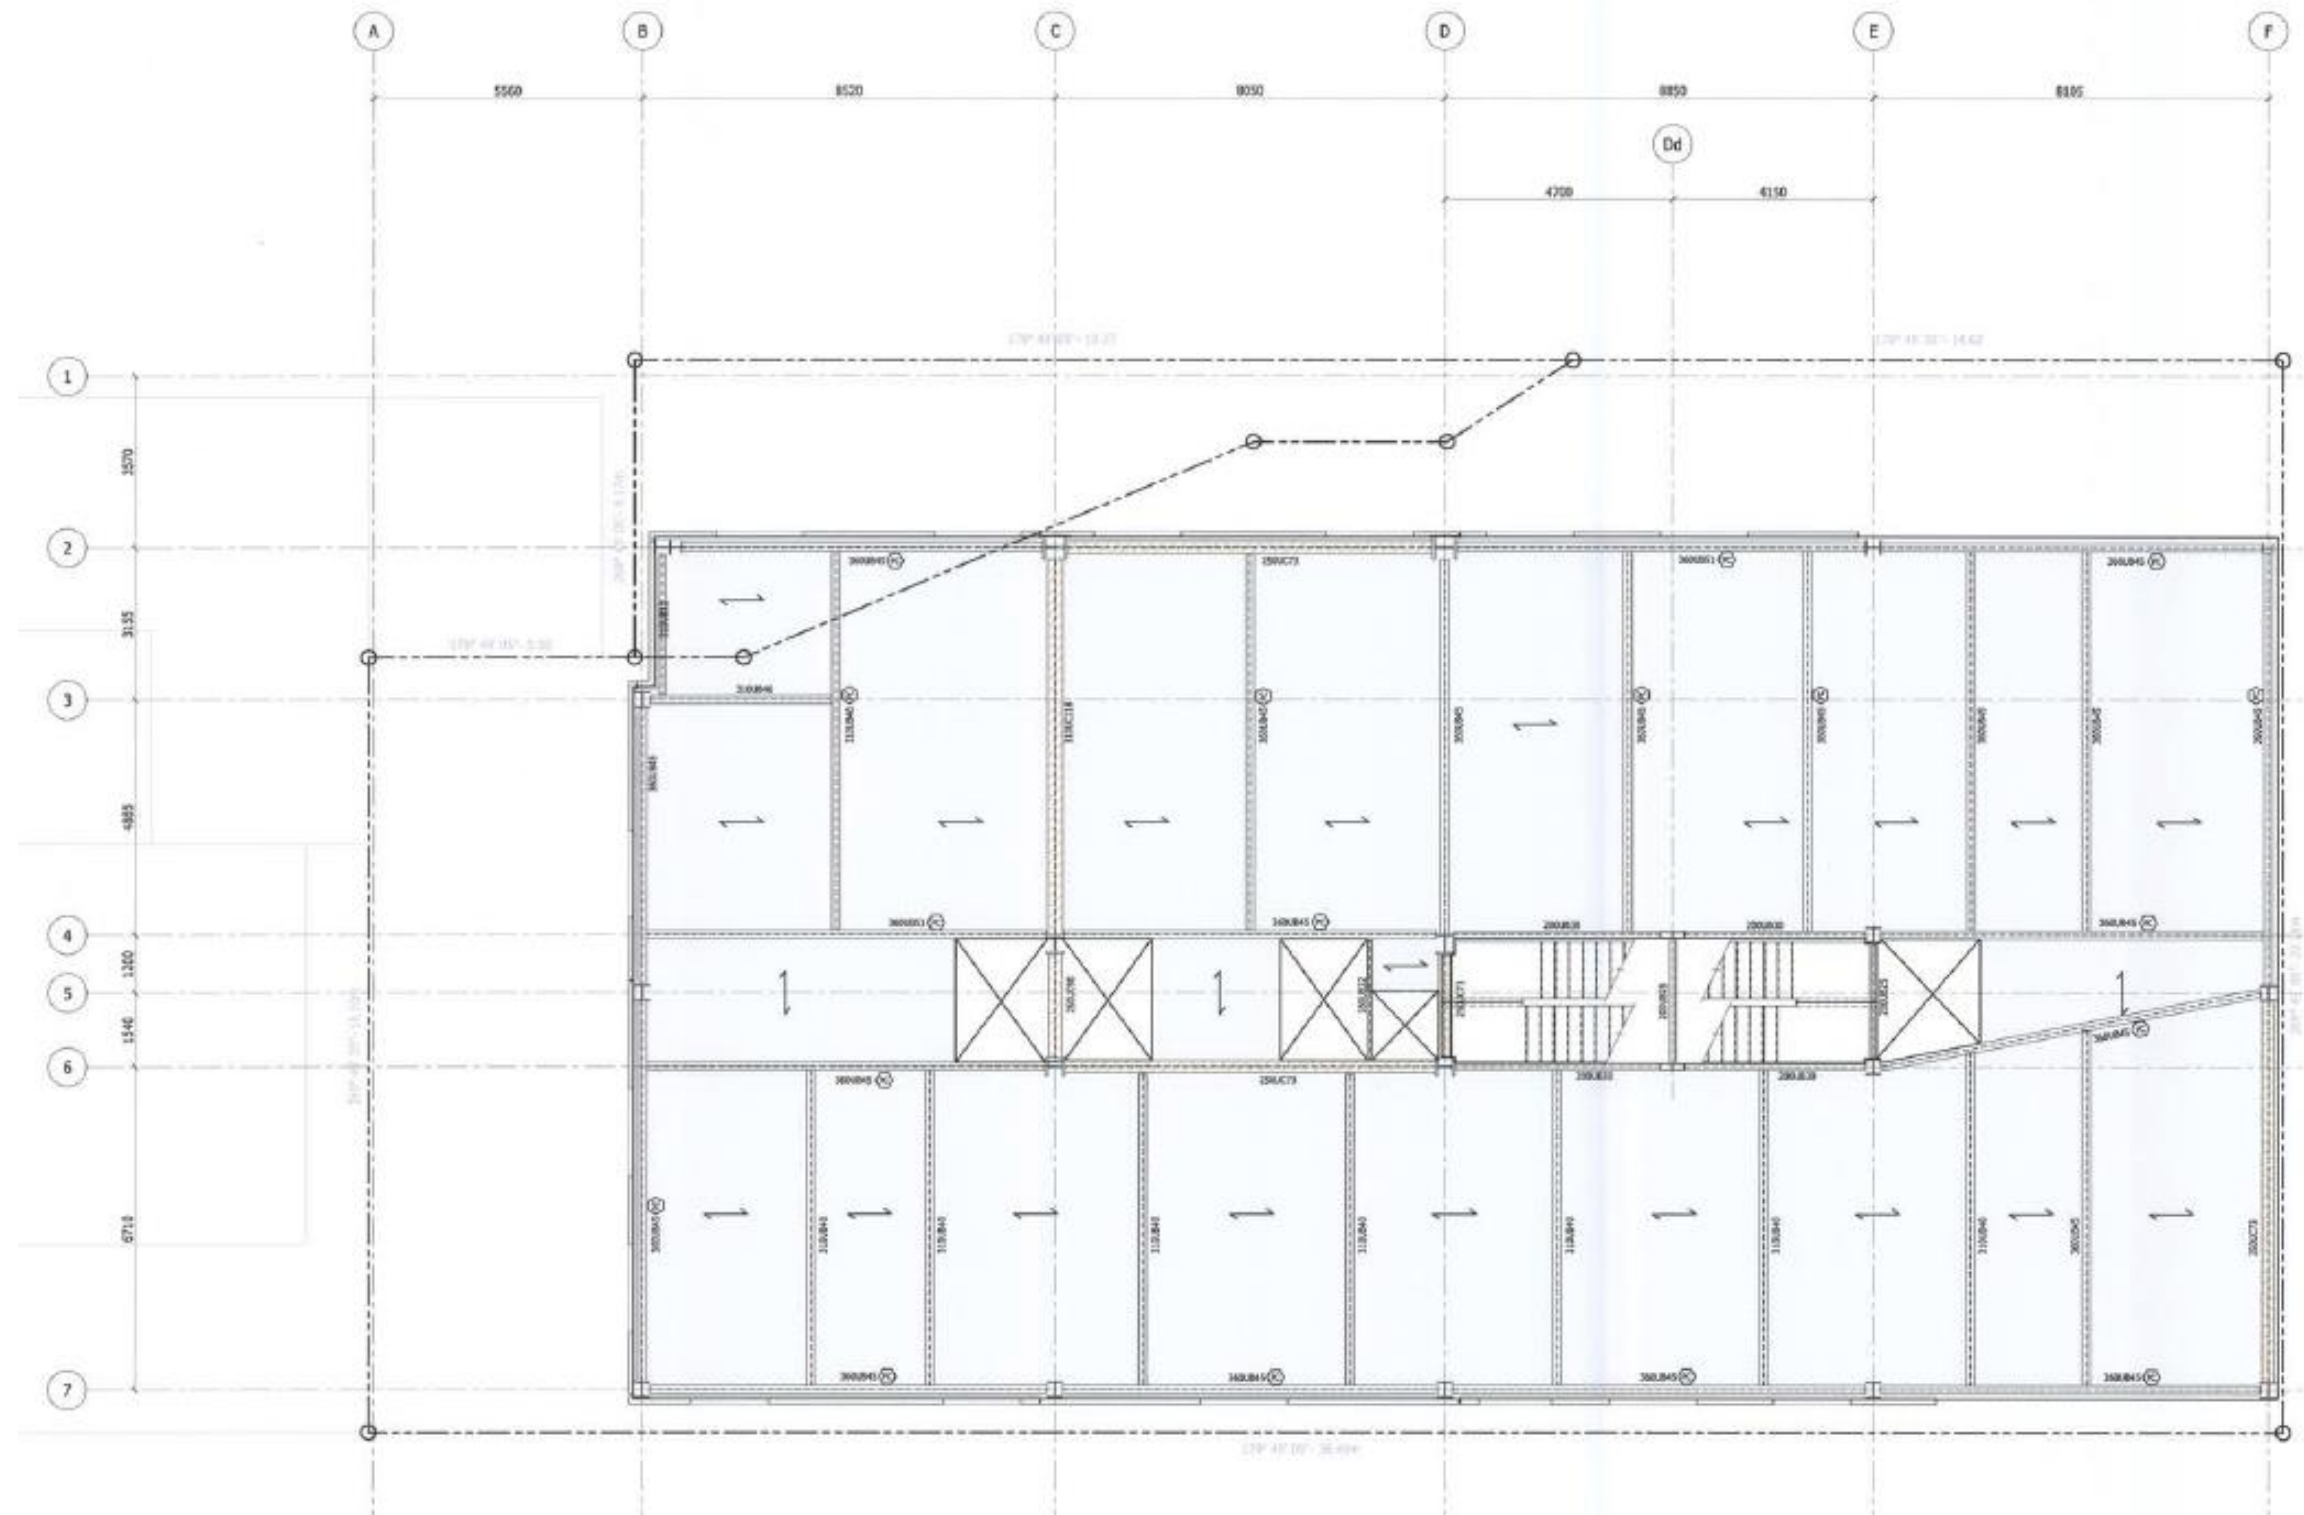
Structural Plan Level 10 (Christchurch City Council 2016c)
